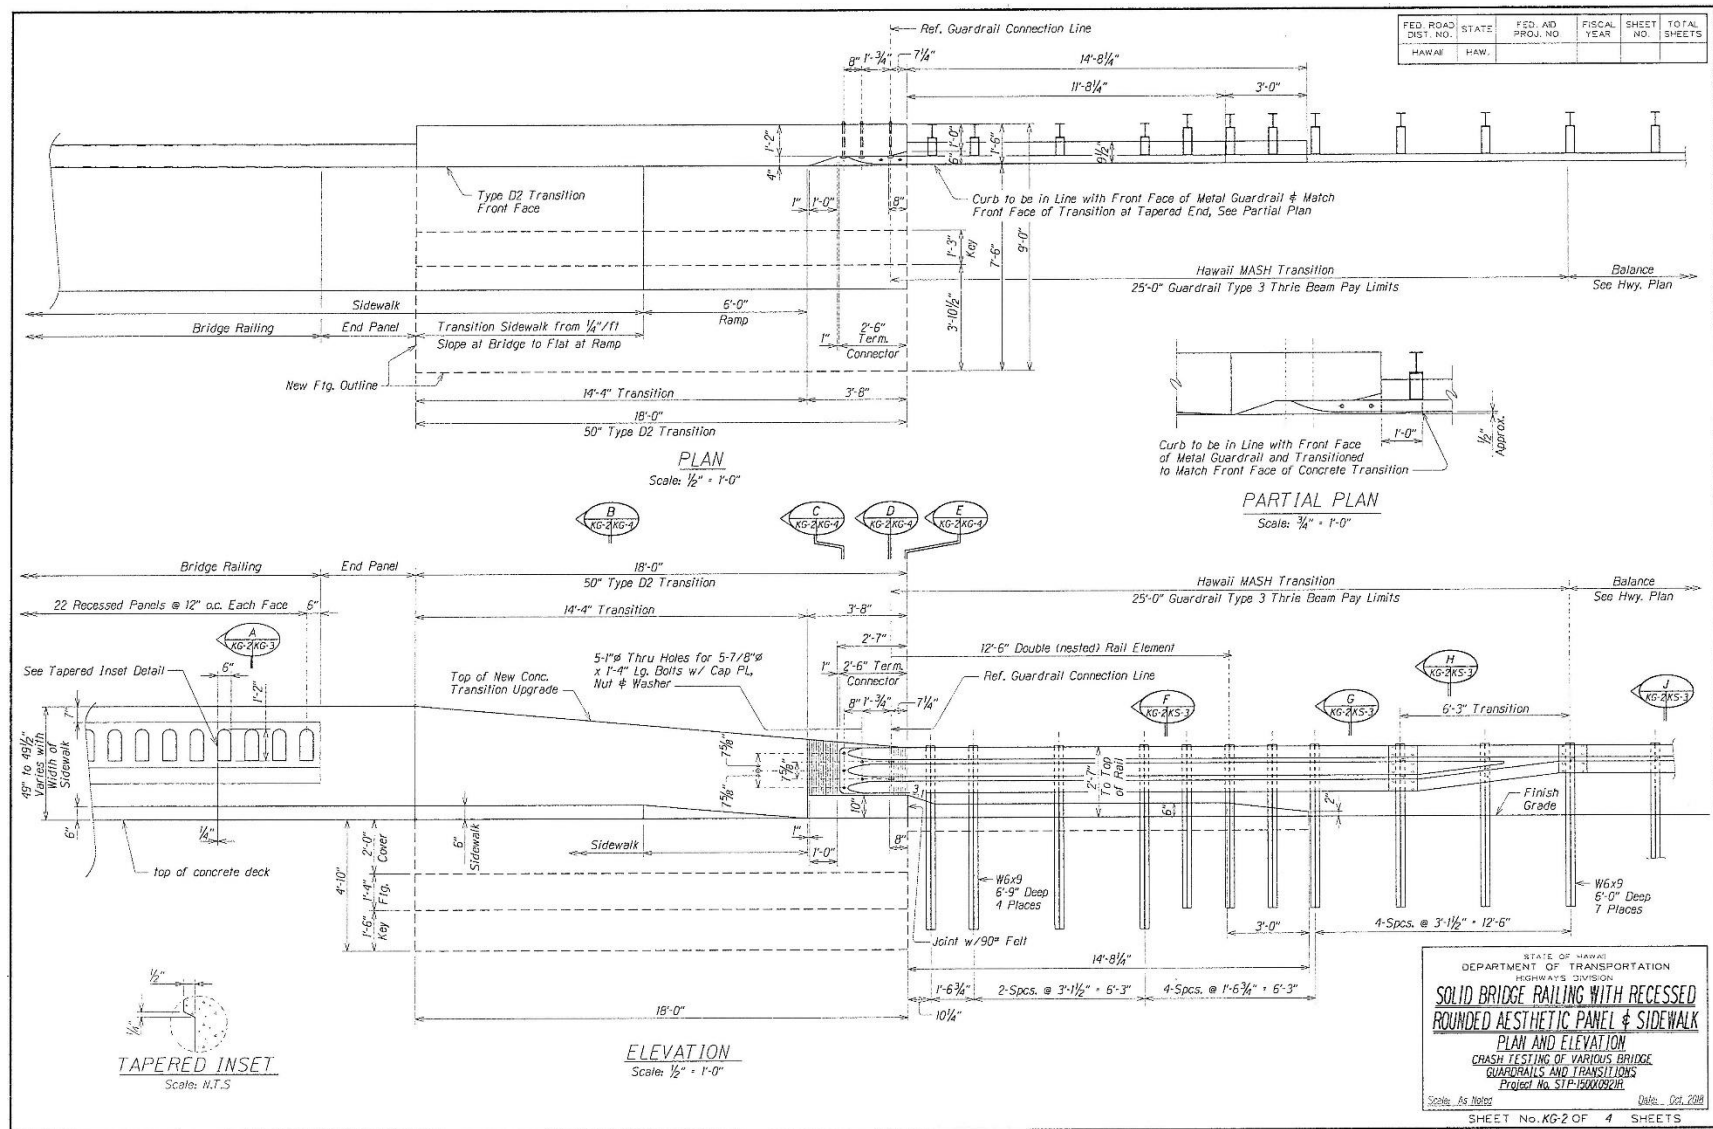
HDOT Standard Detail for 42-in. Tall, Aesthetic Concrete Bridge Rail [1]
